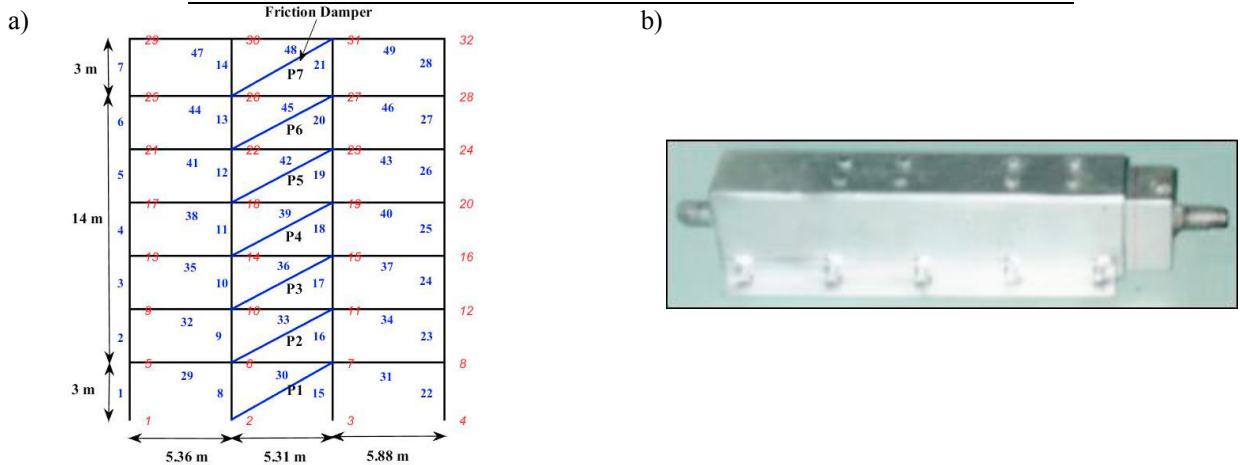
(a) Three-bay 7-story concrete building with 7 friction dampers installed; (b) Friction damper Model-A.
